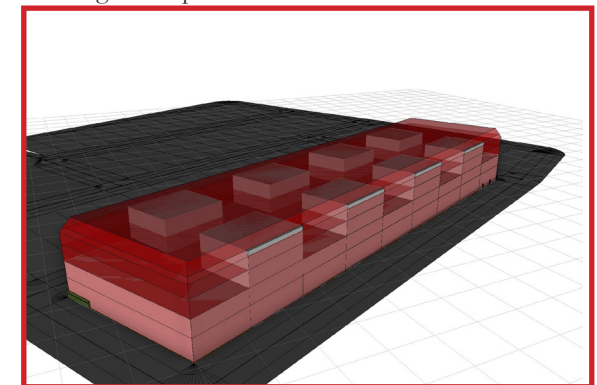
A change in the overall floor height alternates between 2 floors and 4 while staying within the building envelope
